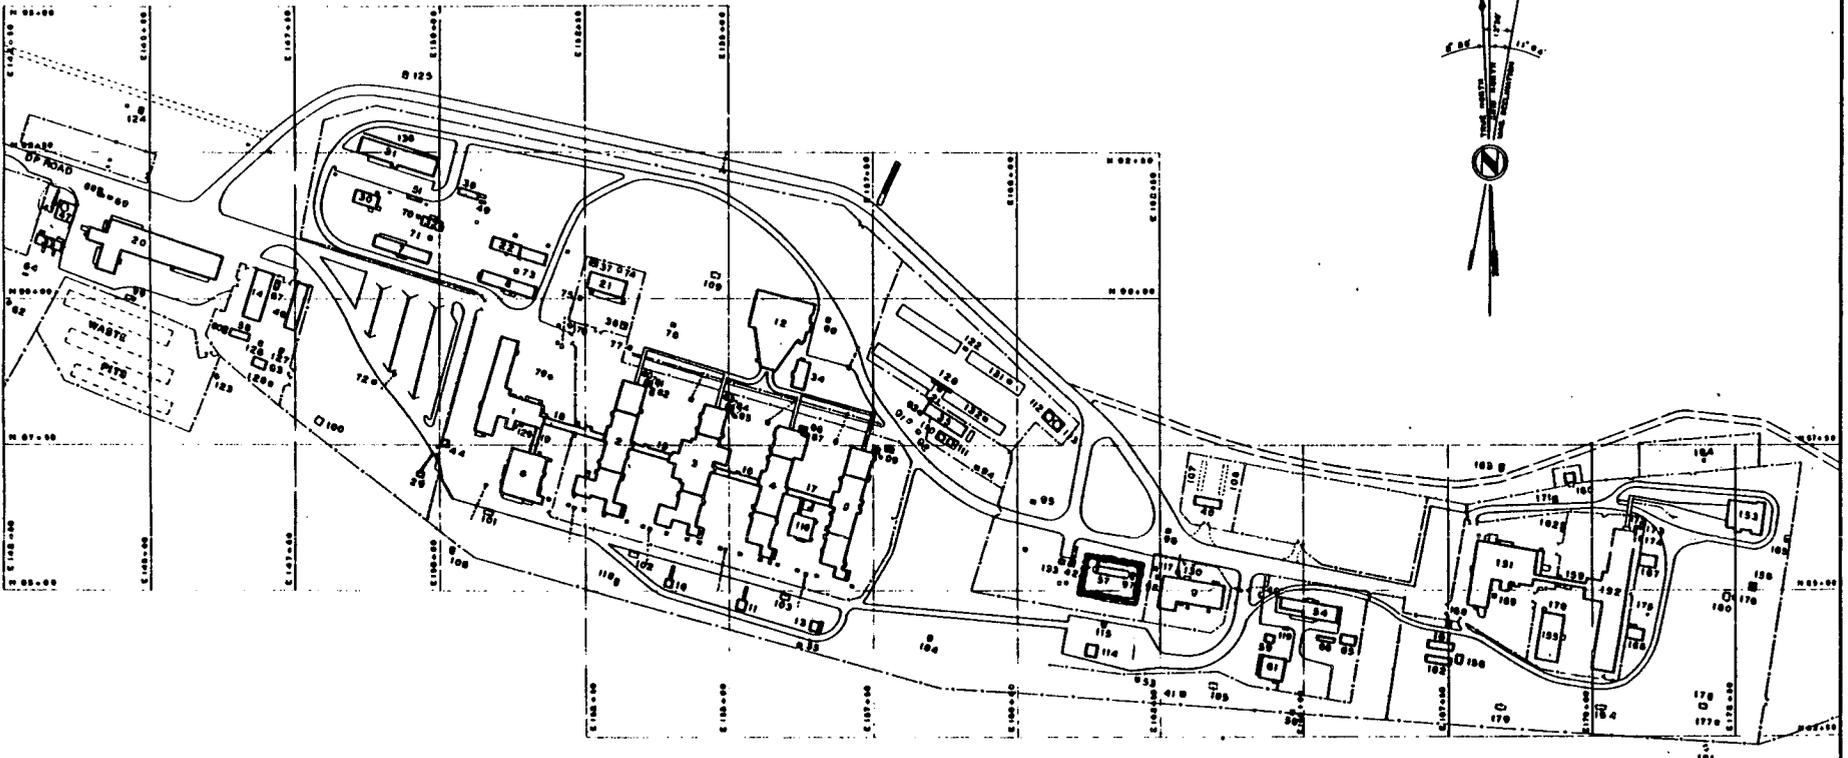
Structure Location Plan for TA-21 - DP Site
